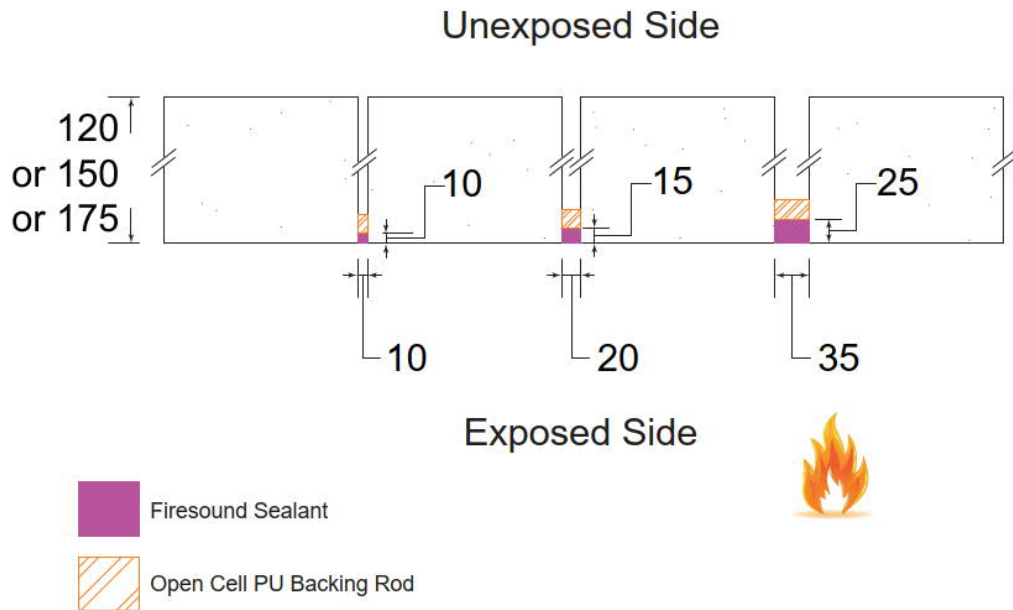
Control joints with HB Fuller Firesound sealant on fire side in concrete walls and floors
